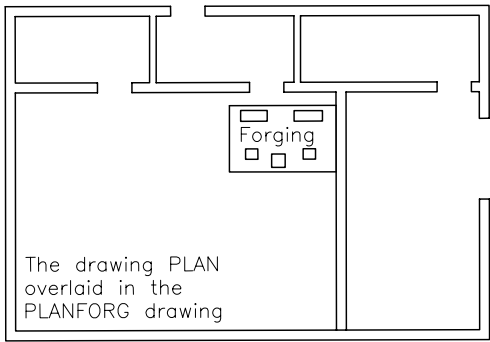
The PLANFORG drawing after overlaying the PLAN drawing
